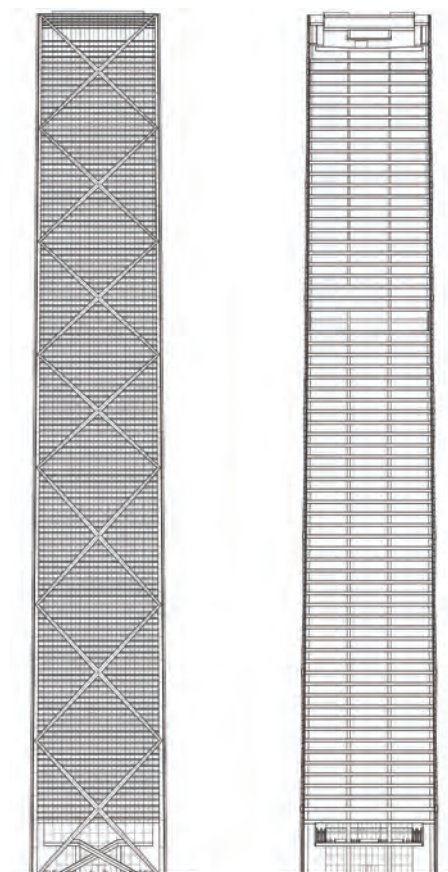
East elevation and section. (Source: Eric Parry Architects)
